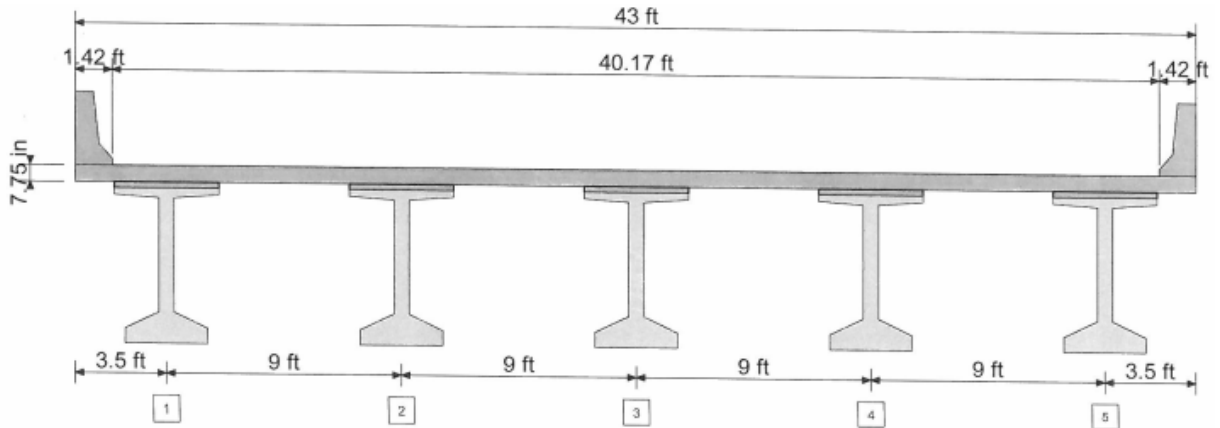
FIB-72 Bridge Transverse Section used for Data Sets
